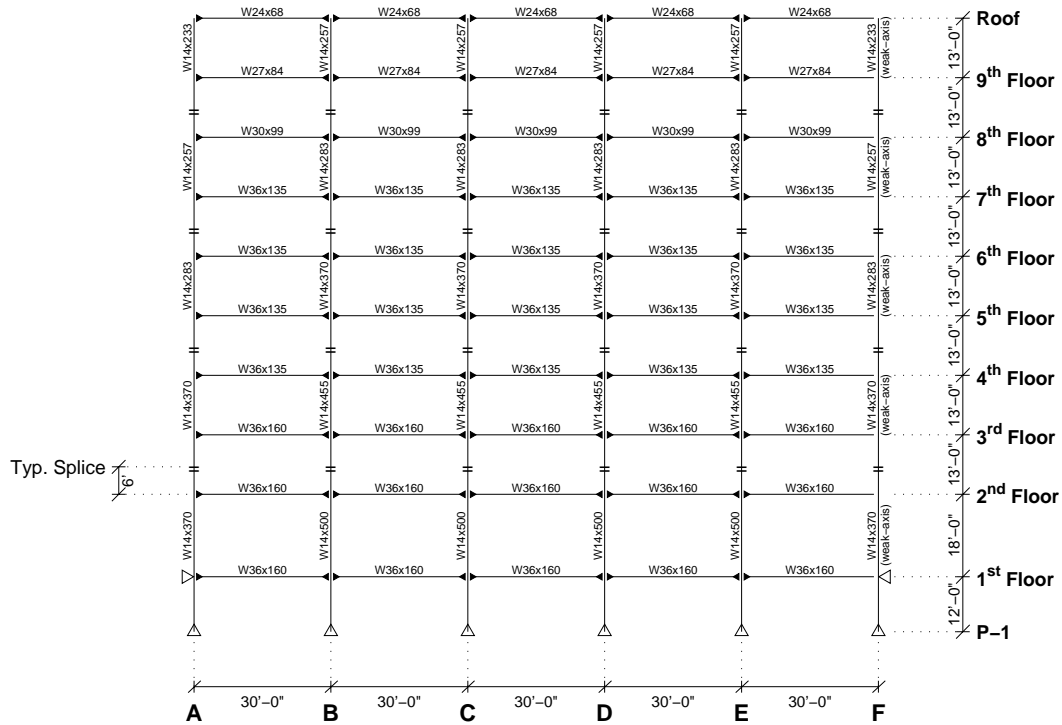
Perimeter moment-resisting frame (N-S elevation) of the SAC 9-story building (excerpted from Luco, 2002)
